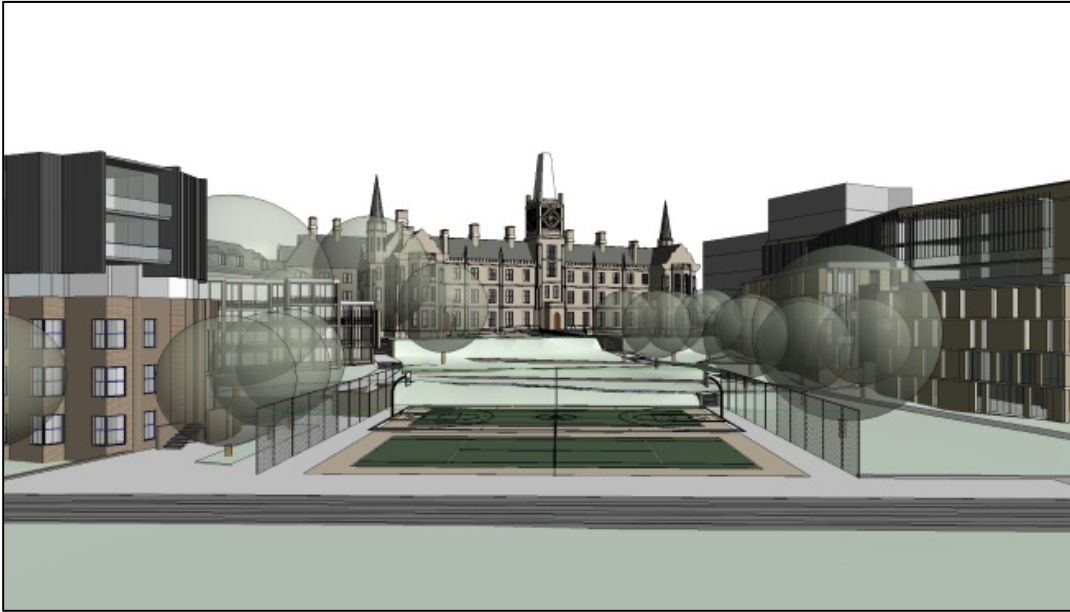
Amended Health Services Facility envelope plan and elevation
